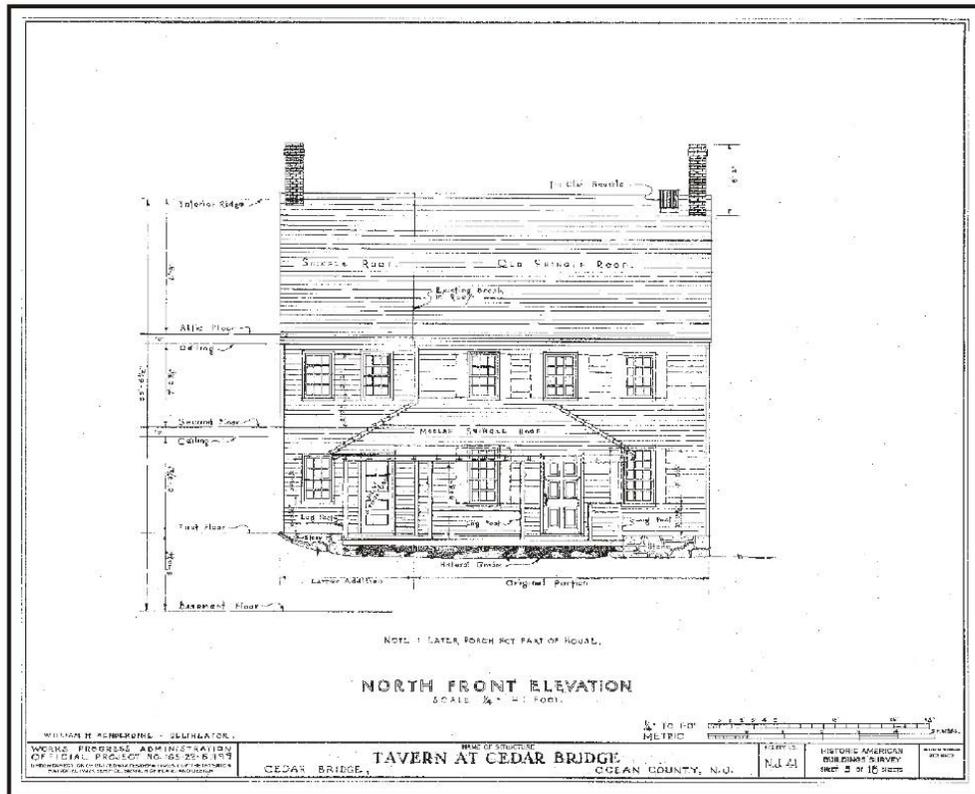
1938 HABS, North Front Elevation of the Tavern at Cedar Bridge (Survey No. N.J. 41). Note original section of the structure (Right two-thirds).
